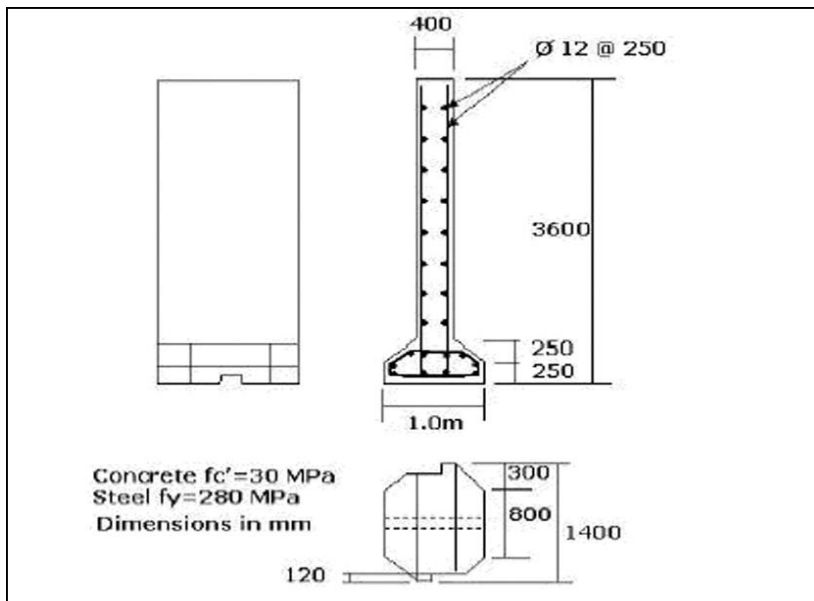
Overlapping concrete revetment with chamfered footings example
